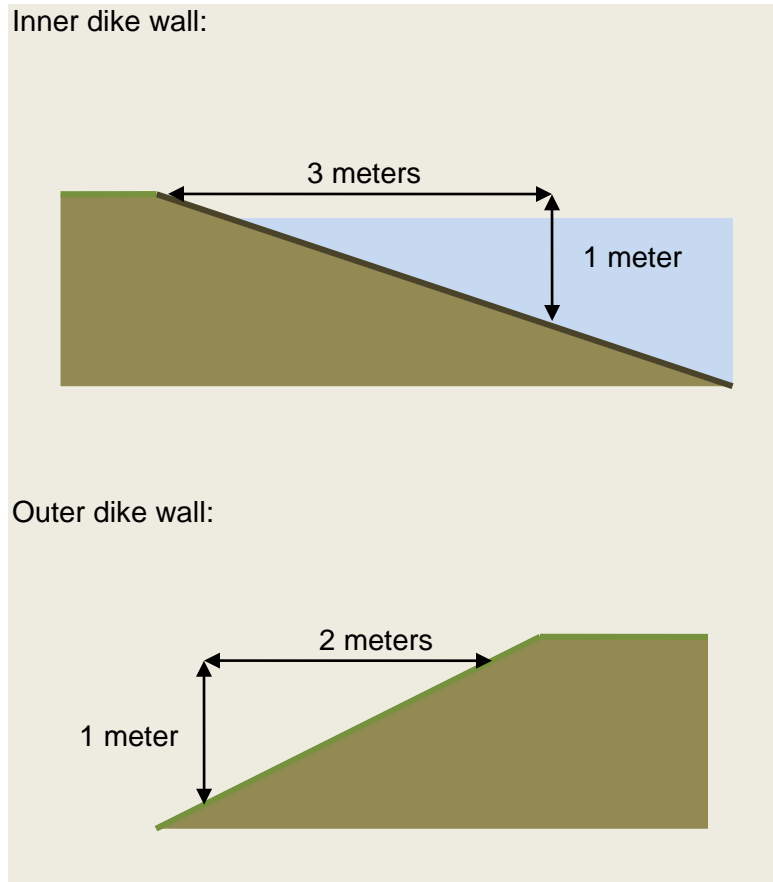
Figure H – Schematic showing interior and exterior slopes of a RAP standard pond
